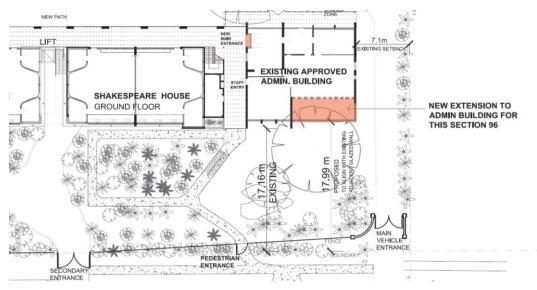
Proposed Site Plan Extract showing setbacks (Source: Templum)
